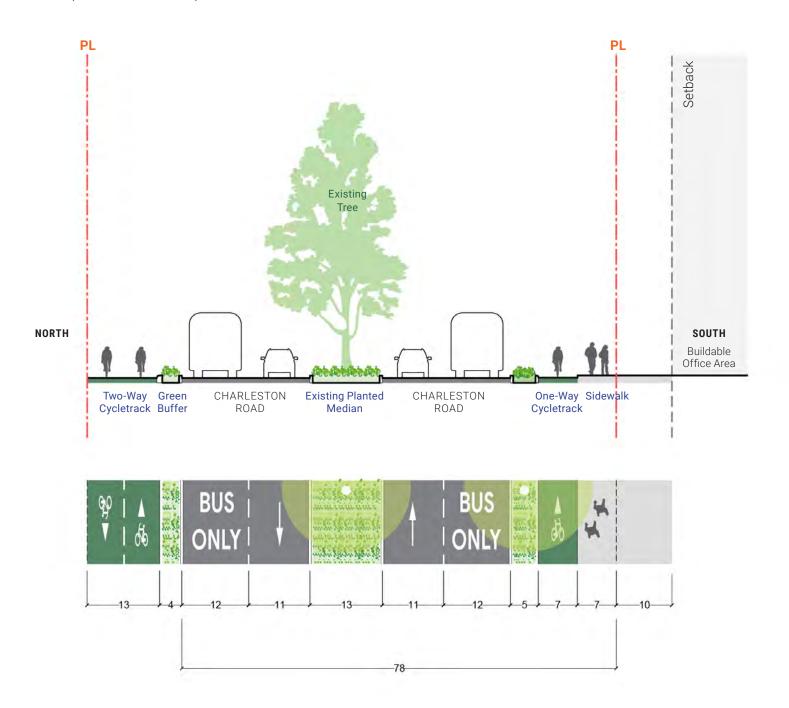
CHARLESTON ROAD SECTION 03 (WEST OF MANZANITA)
